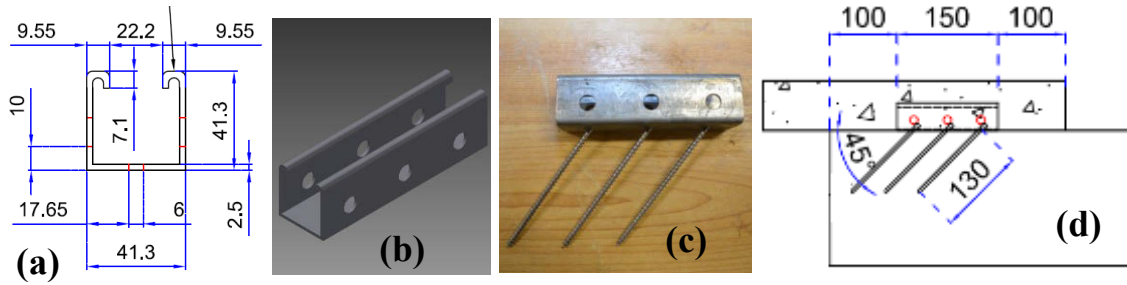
U connector (a) dimensions (b) and (c) UniStrut profile and (d) TCC specimen
